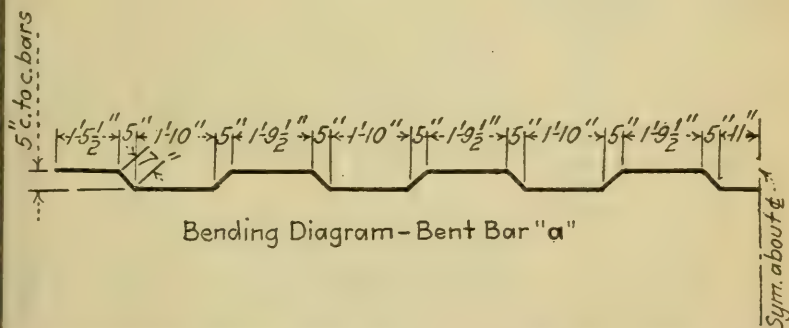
A (Cont.). — Bar bending diagram. Floor slab. I-beam stringer bridge. 30 ft. roadway.
